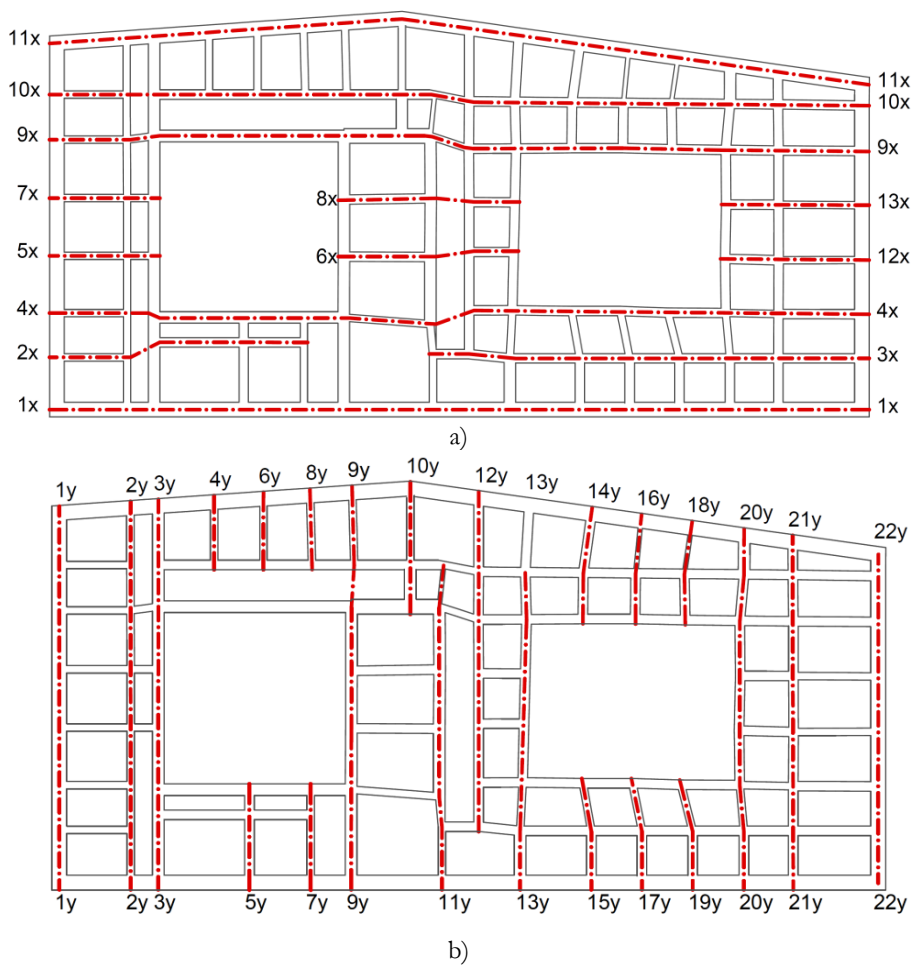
Ex prison S. Francesco*: a) longitudinal walls; b) transversal walls
